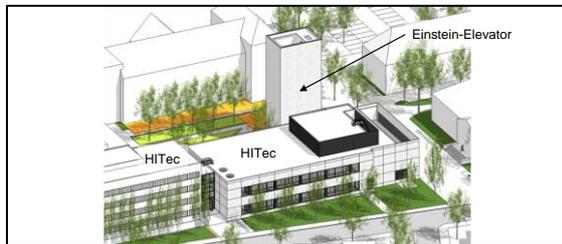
Existing HITec facility (left), new facility (middle) and Einstein-Elevator's tower (source: Carpus+Partner)
